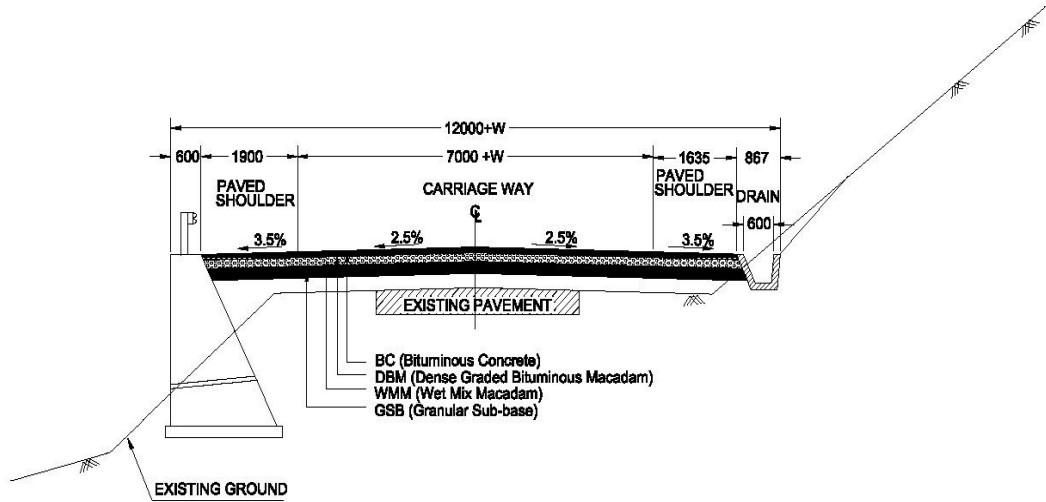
(2): Typical Cross Section for Widening Primarily to Valley Side
